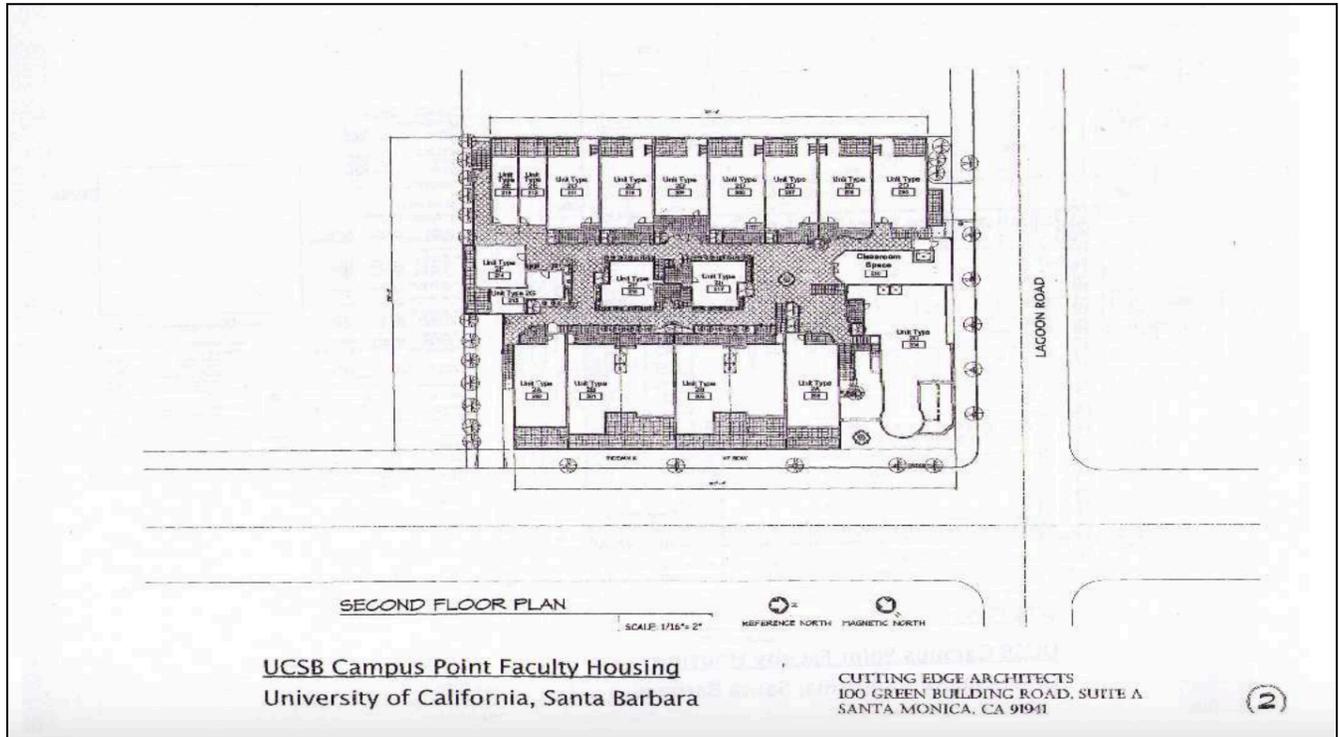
UCSB Campus Point Faculty Housing Building Site Plans, Second Floor
